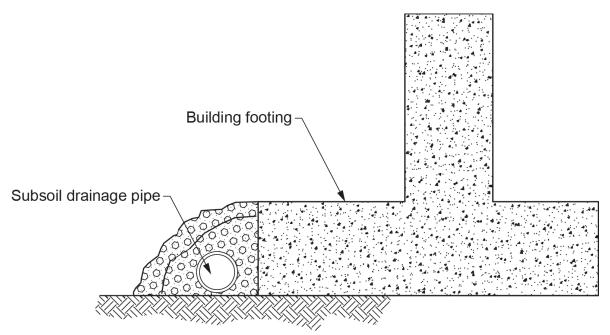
Subsoil drainage pipe. (Skilled Trades BC, 2021) Used with permission.
